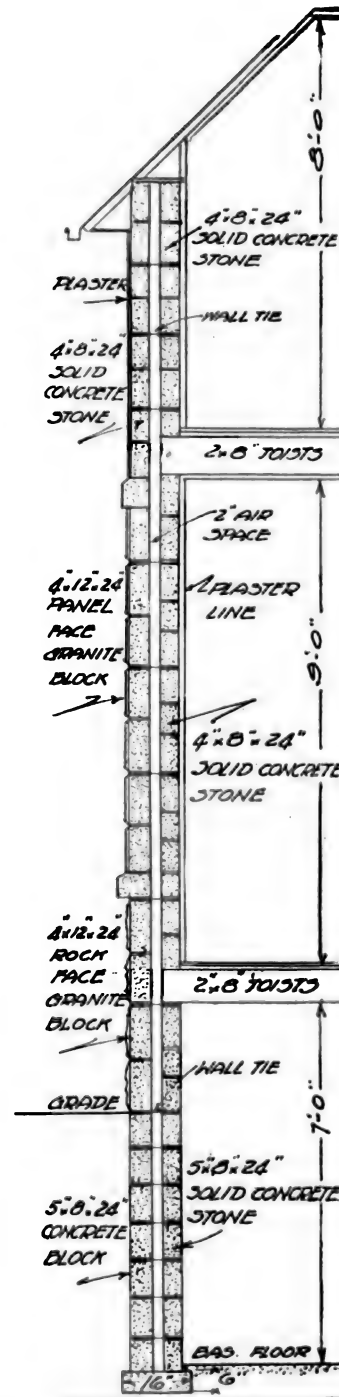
WALL SECTION OF CONCRETE BLOCK HOUSE
